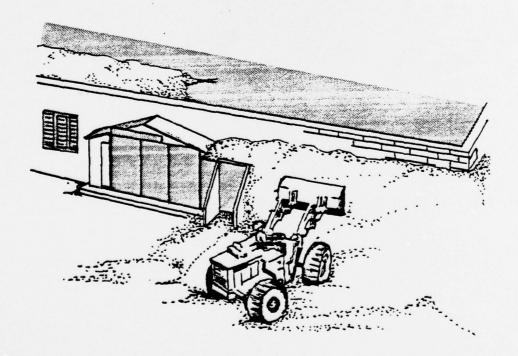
PLACING BERM AROUND EXTERIOR WALLS.
